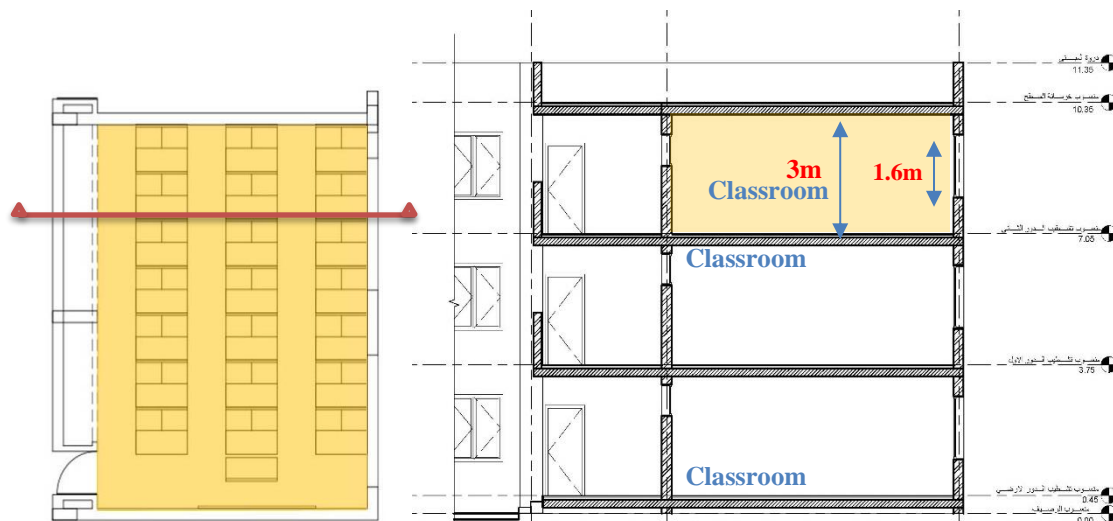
Plan and Section of one of the classrooms on the second floor in the building of the First District Secondary School for Girls in Sheikh Zayed.
